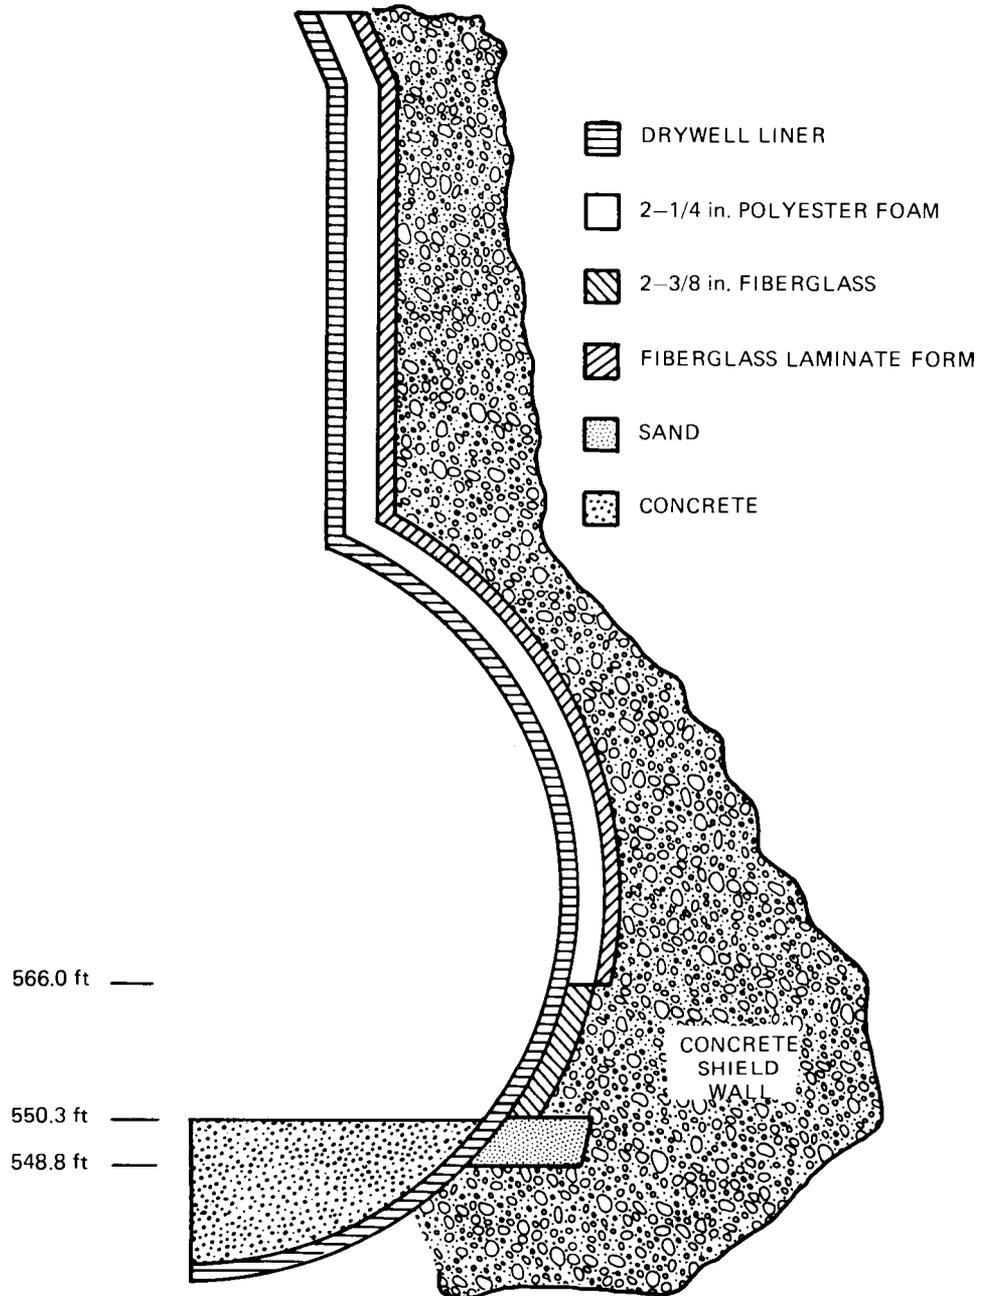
BFNP drywell liner - concrete shield wall gap construction.
